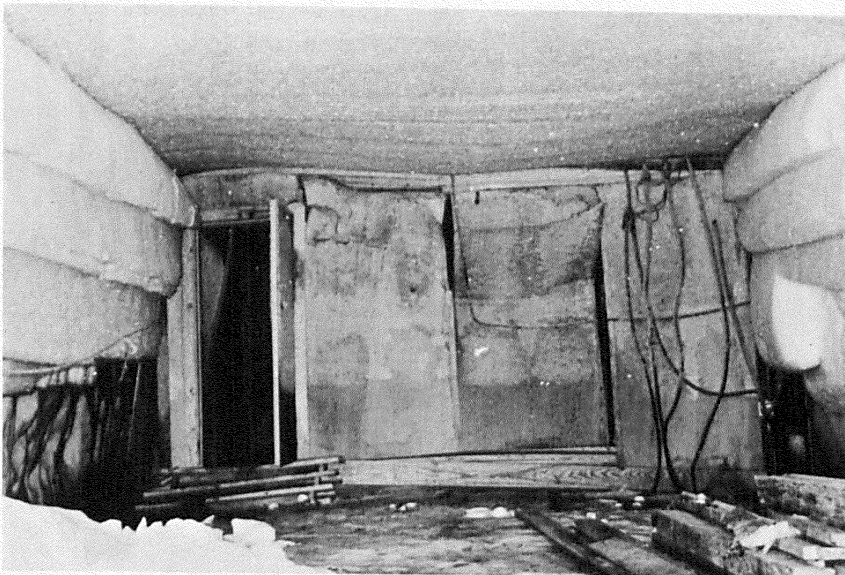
Narrow passageway leading to Trench 10 escape hatch.
